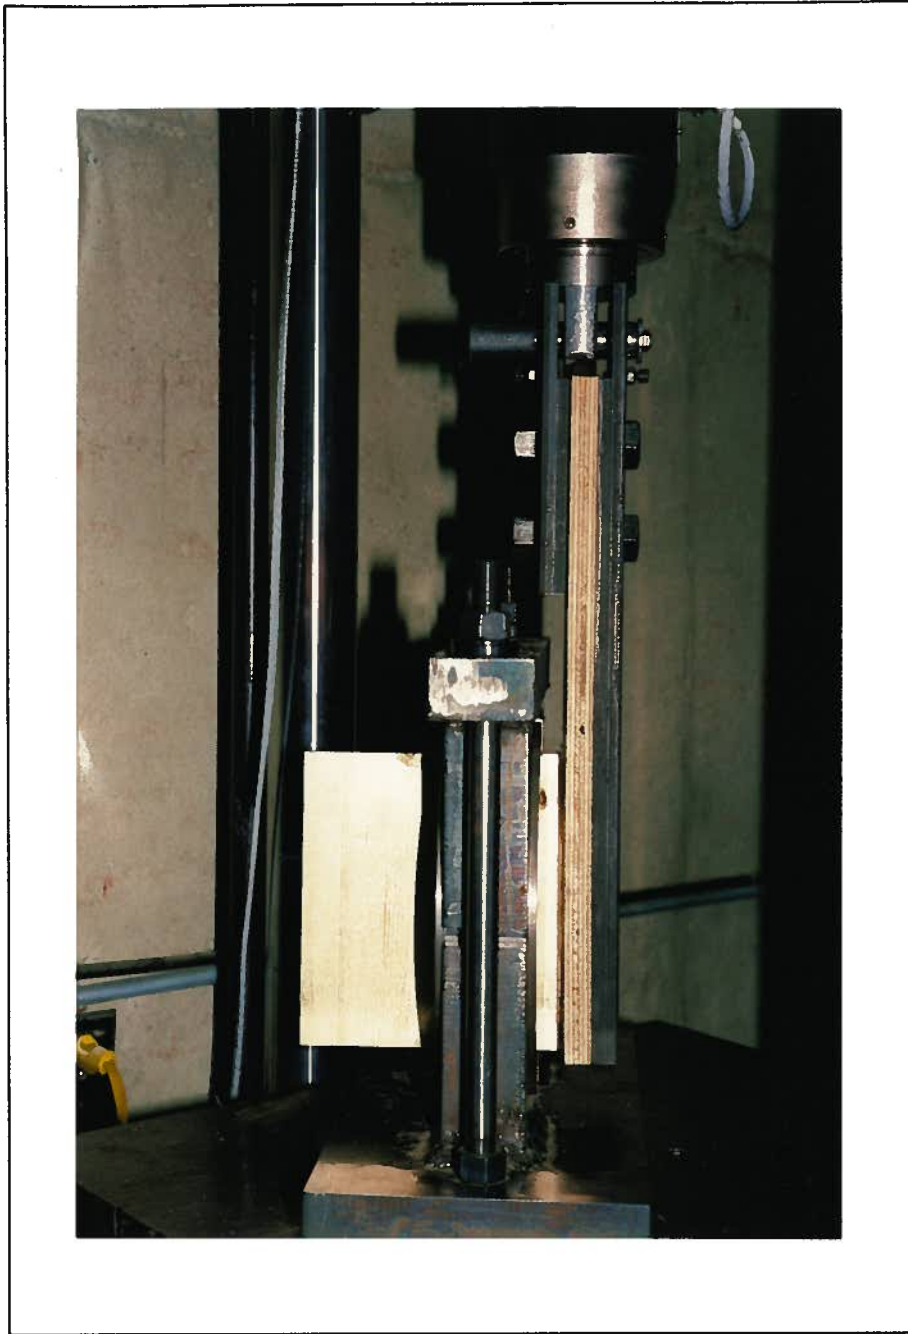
Test setup for testing the joist/plywood connection in shear; side view
